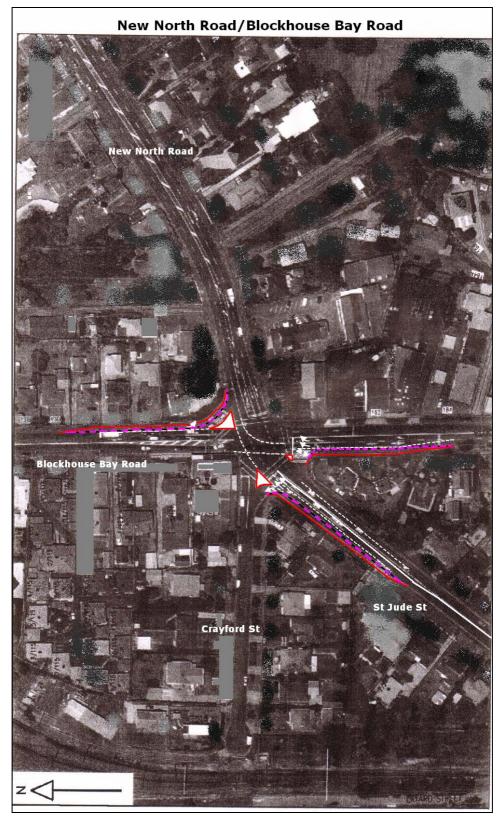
Feasibility plan of the New North Road/Blockhouse Bay Road intersection (not to scale).
